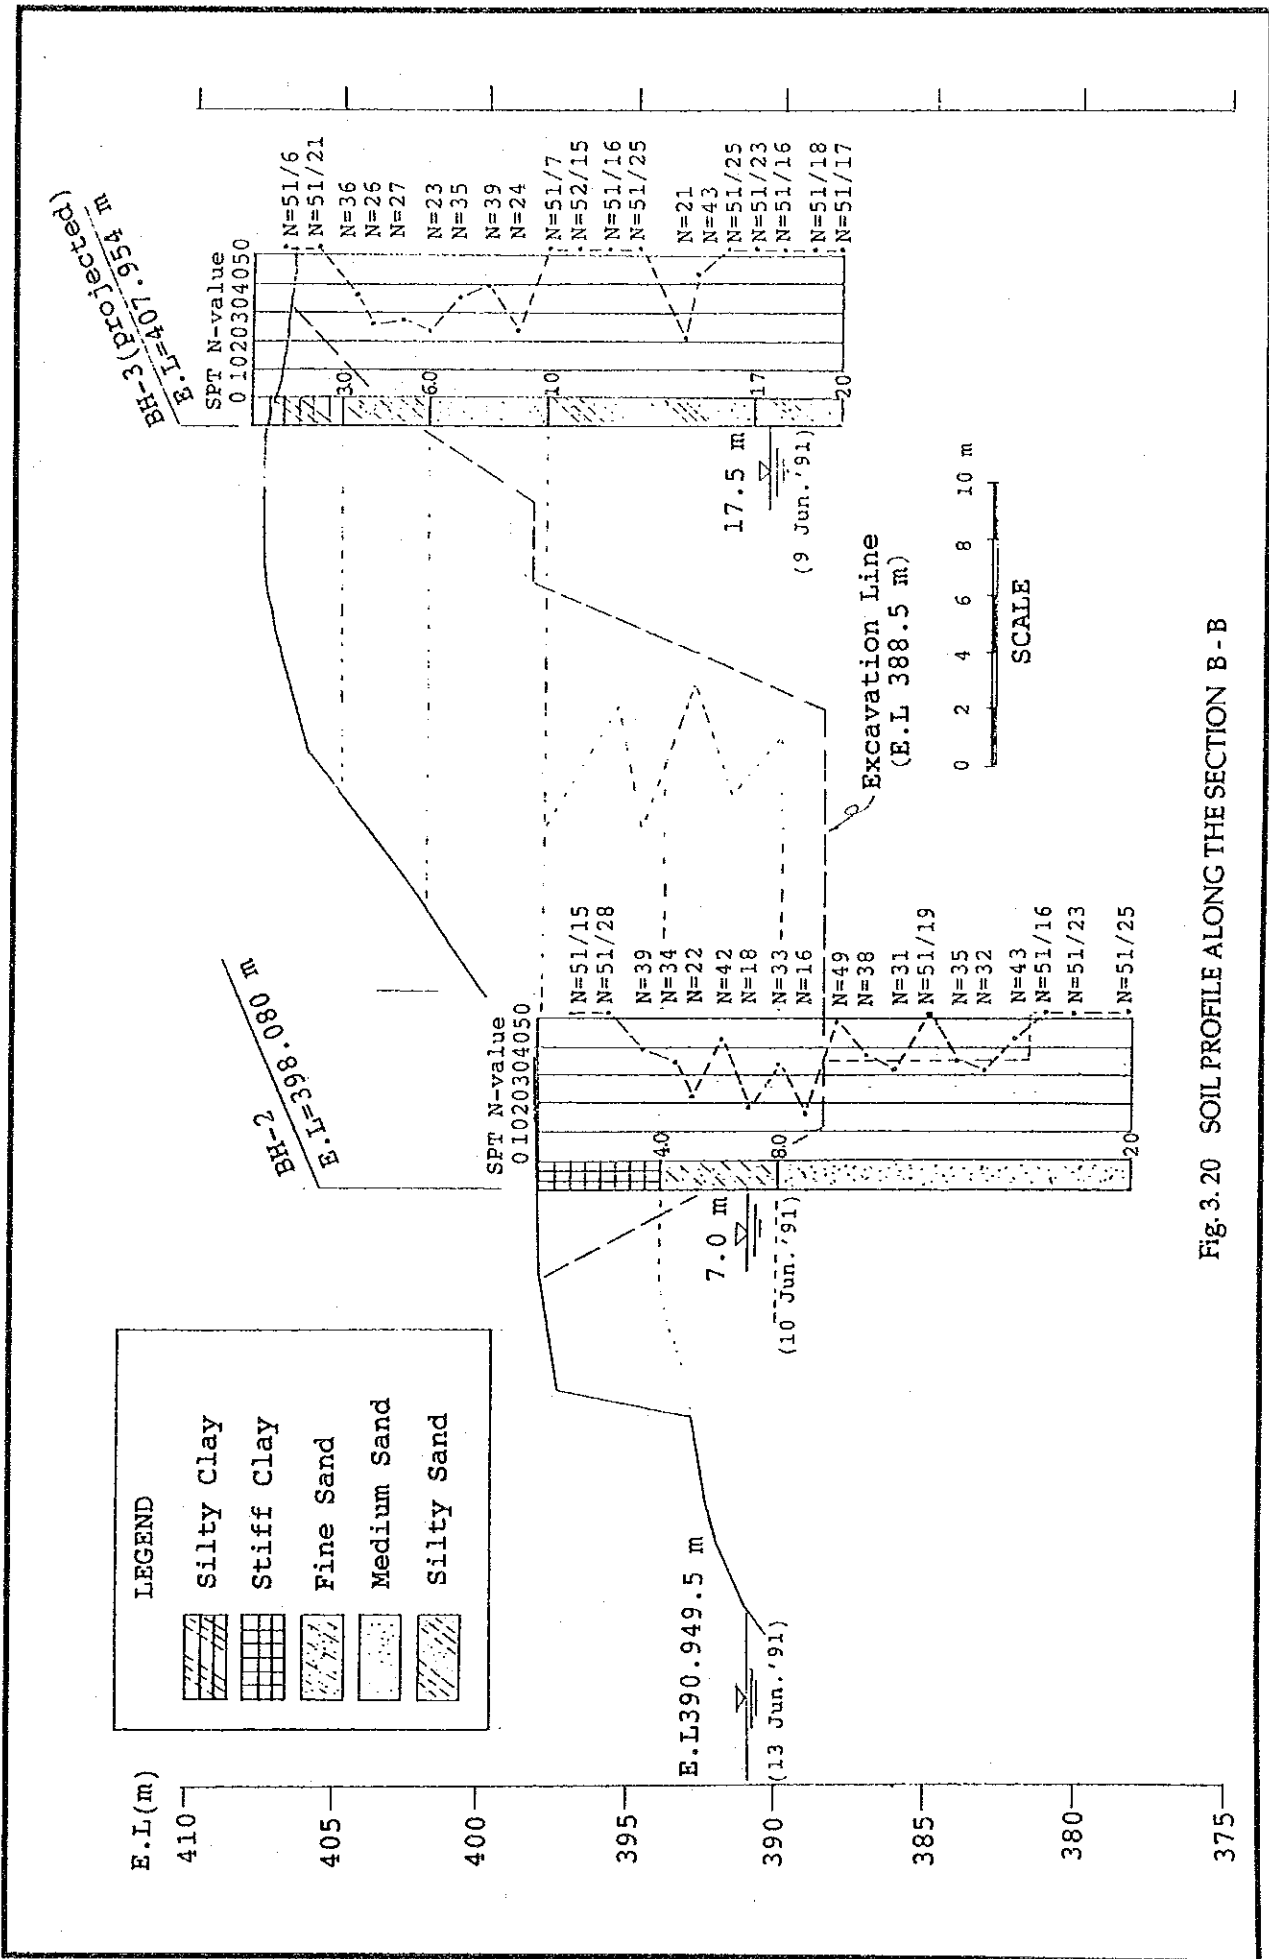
SOIL PROFILE ALONG THE SECTION B - B
